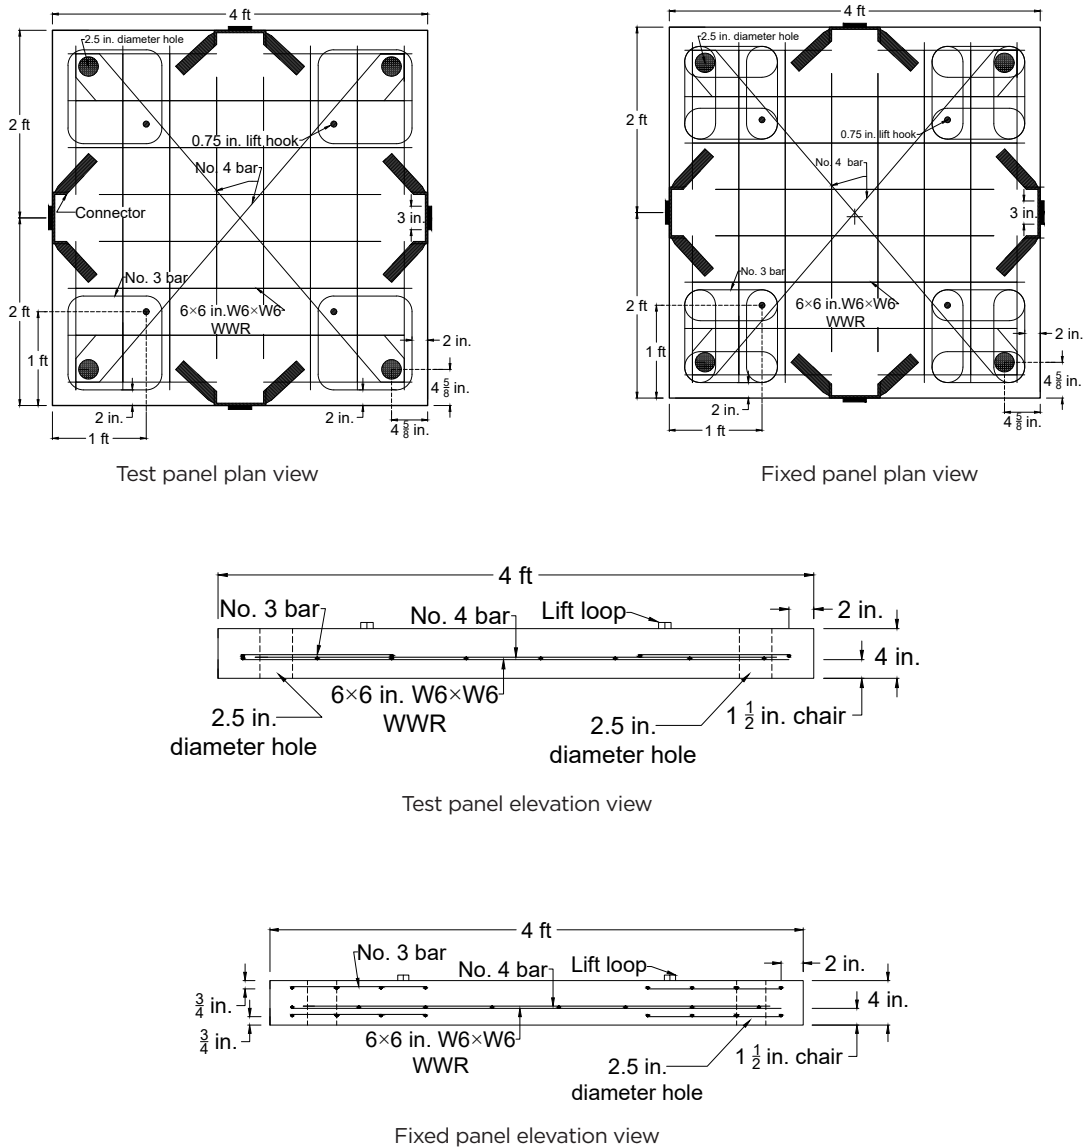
Slab reinforcement details of the shear/alignment connector specimen (behind the connector). Note: WWR = welded-wire reinforcement. No. 3 = 10M; no. 4 = 13M; 1 in. = 25.4 mm; 1 ft = 0.305 m; W6 = 152 mm.
